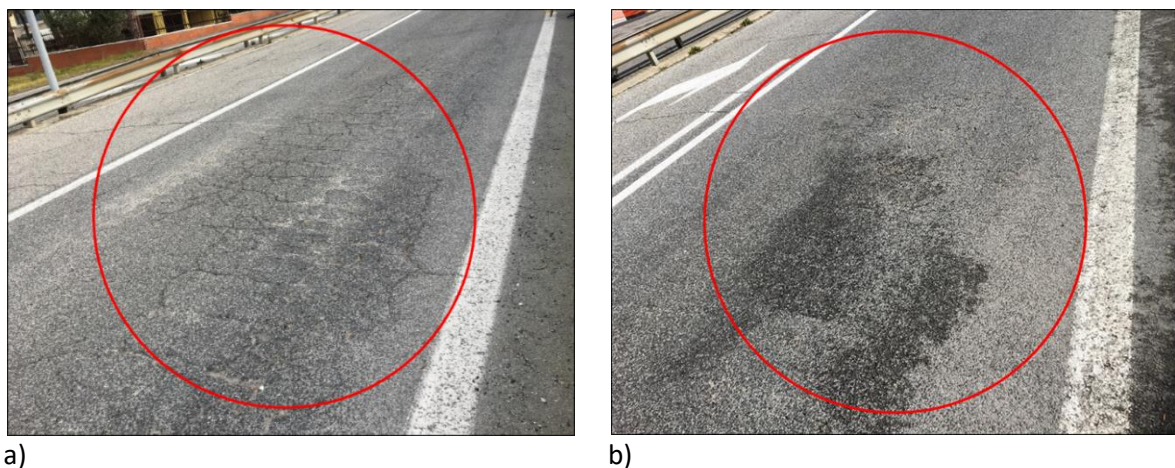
Pavement conditions before the maintenance: a) subsection 1, b) subsection 2
